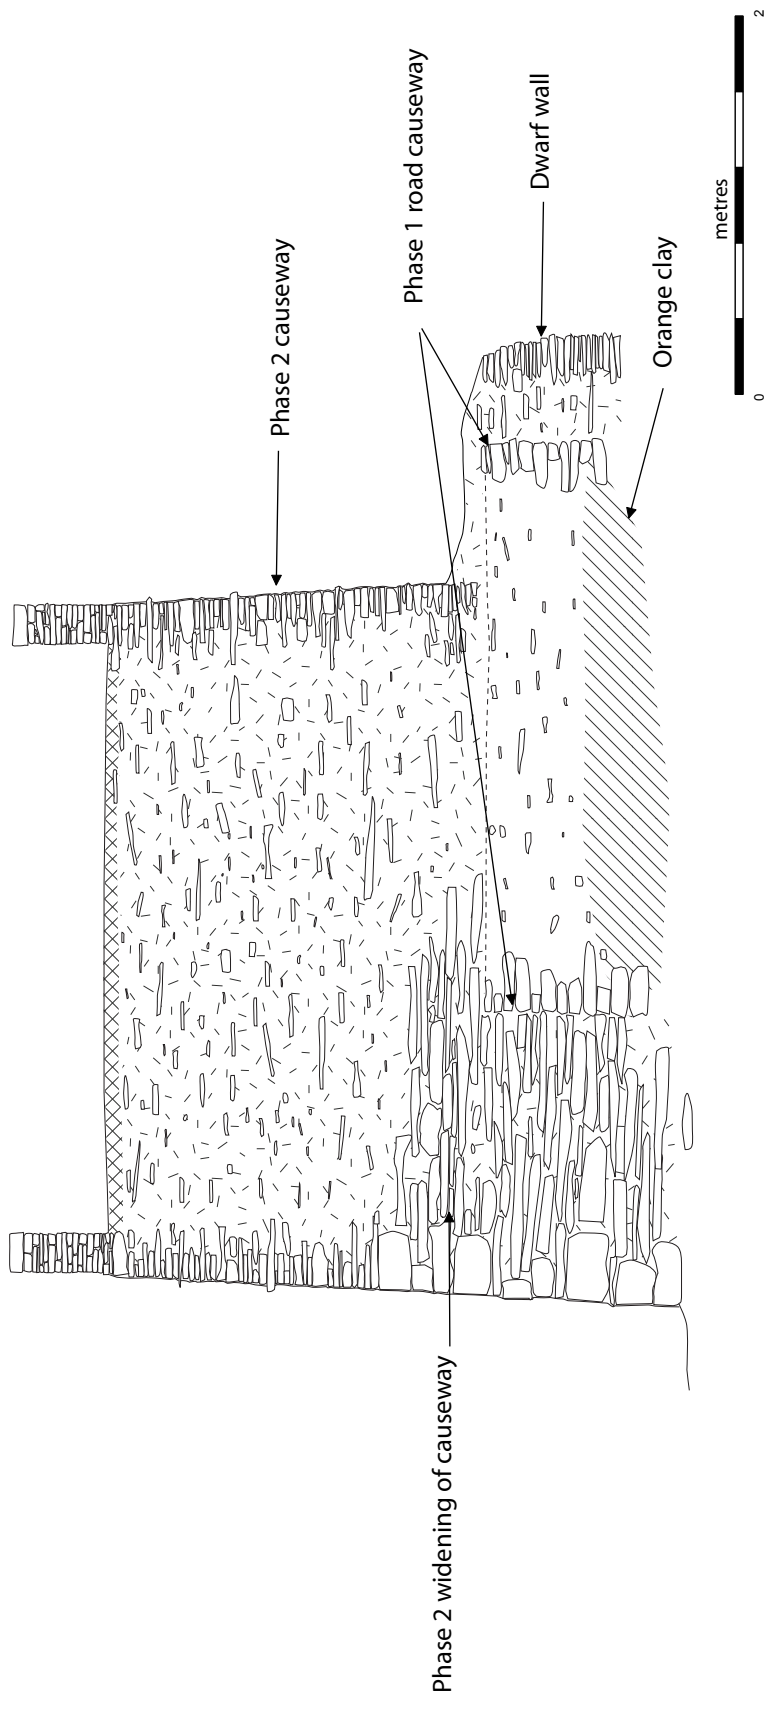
South facing sketch section through site 3(32) road causeway 5m north of Afon Barlwyd tunnel
